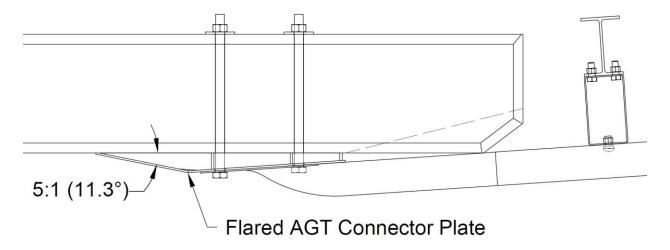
Option 3 – Angled Connector Plate Assembly, Enlarged
